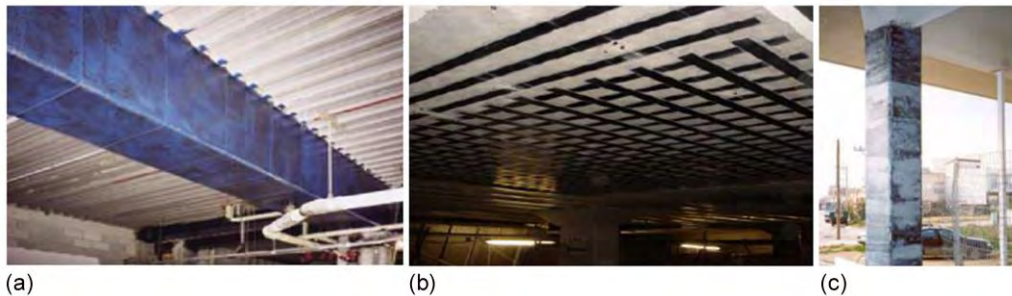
Examples of EBR installation in strengthening: (a) Beams, (b) Slabs and (c) Columns [22,23].
